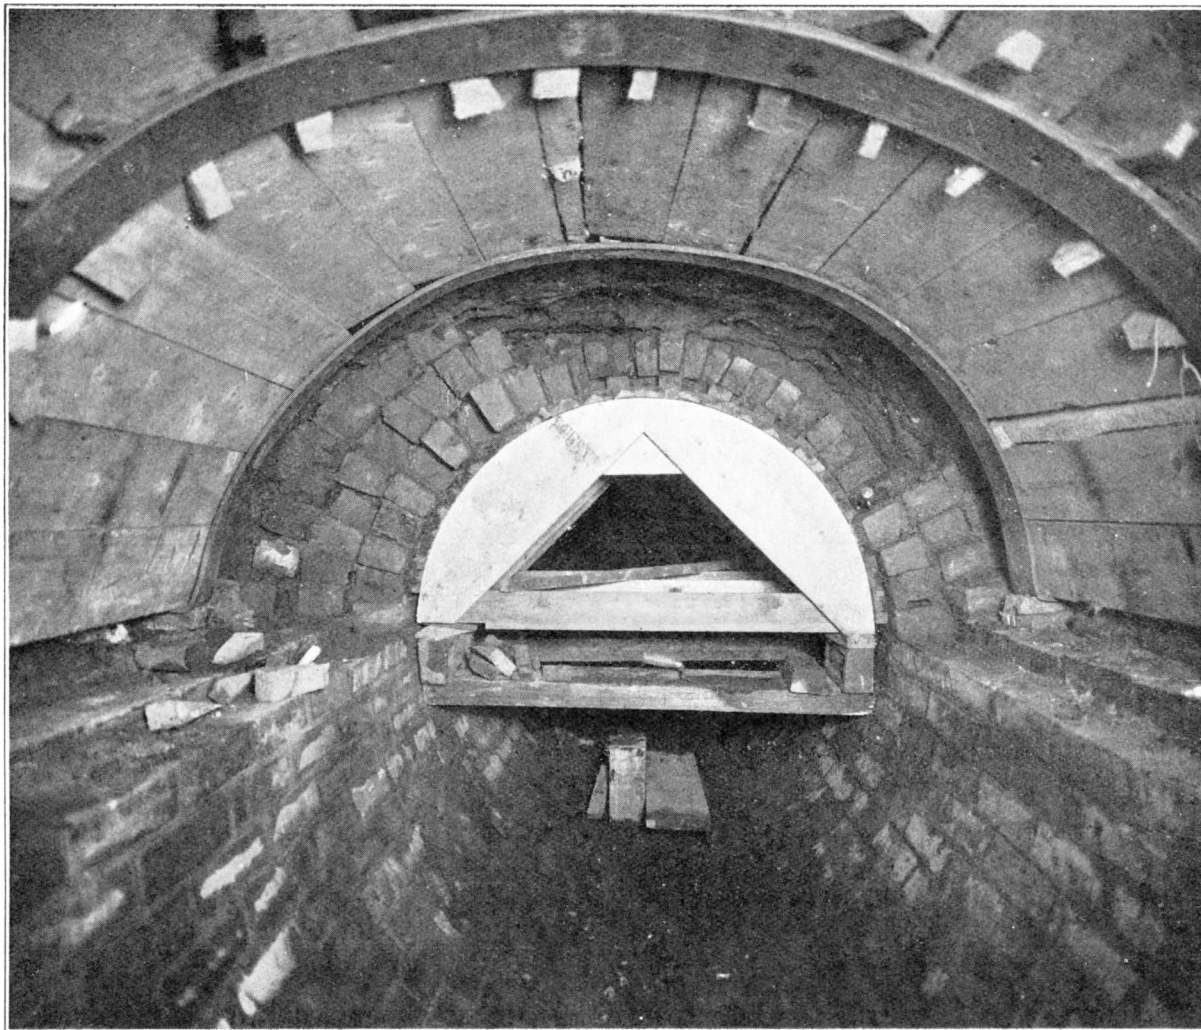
TUNNEL UNDER MANCHESTER-ROCHDALE CANAL: CONSTRUCTION OF BRICK SUBWAY.
